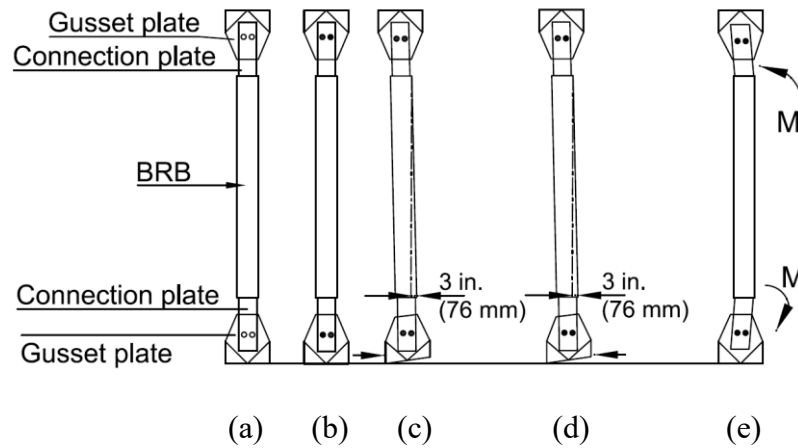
Procedure to assemble the BRB to the gusset plate, (a) The BRB is set up vertically, (b) Bolts are inserted into bolt holes, (c) Bottom gusset plate is moved to 3 in. off the vertical axis, (d) Bolts are tightened, then bottom gusset plate is moved back to vertical axis and (e) Moments are created on both ends of BRB
